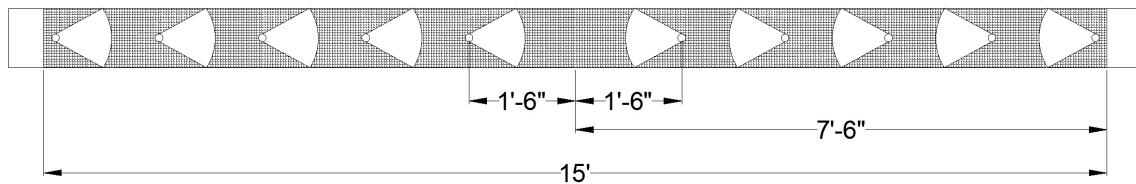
View of Bottom of Beam with Carbon FRP Sheet and Splay Anchors
